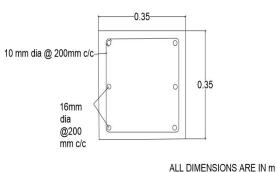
REINFORCEMENT DETAILS OF SLAB
